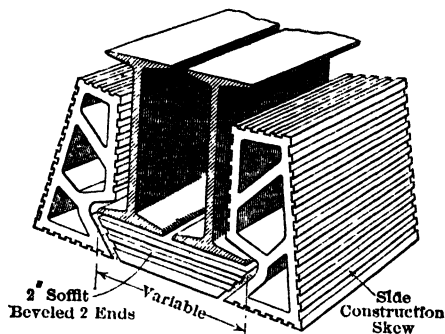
Illustrating Method of Protecting Double Beams Supporting End-construction Flat-arch Floor with Side-construction Skews
